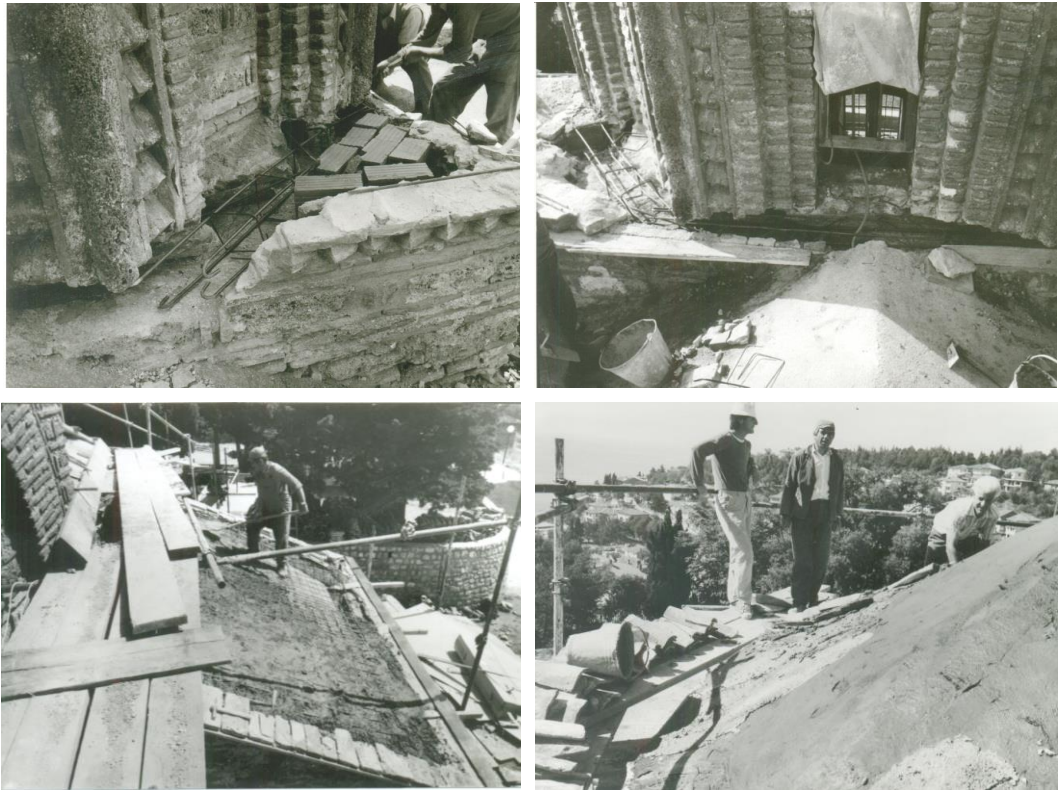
Incorporation of reinforced concrete elements (tambour, vault, dome) (1986)
